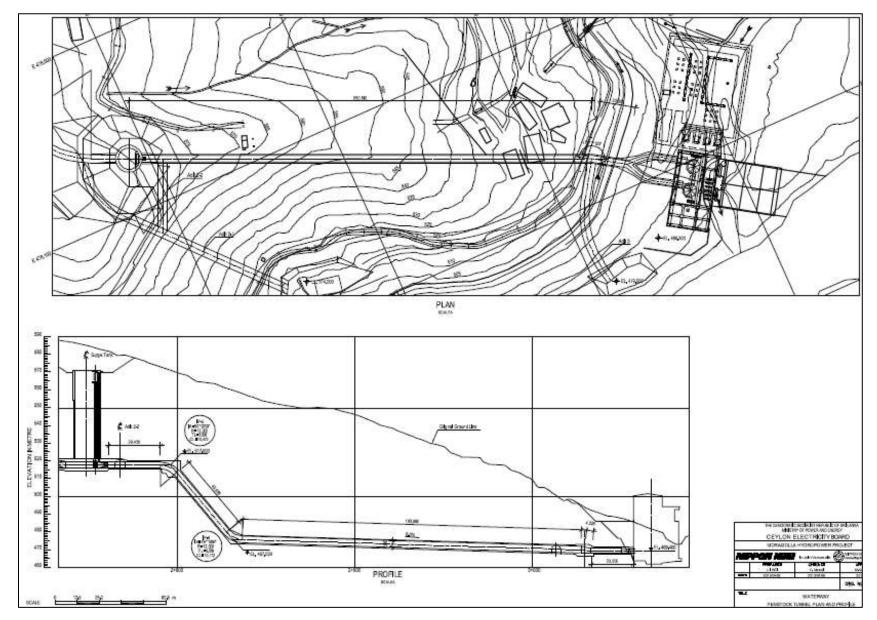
Plan and profile of the headrace tunnel (downstream), surge tank, penstock and tailrace outfall
